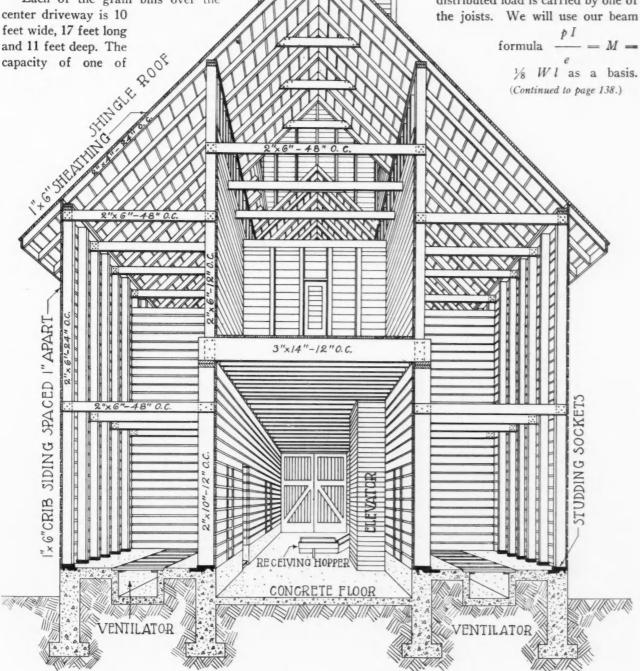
C. Section and Interior Prospective of Grain Storage Building, Showing Details of Framing.
